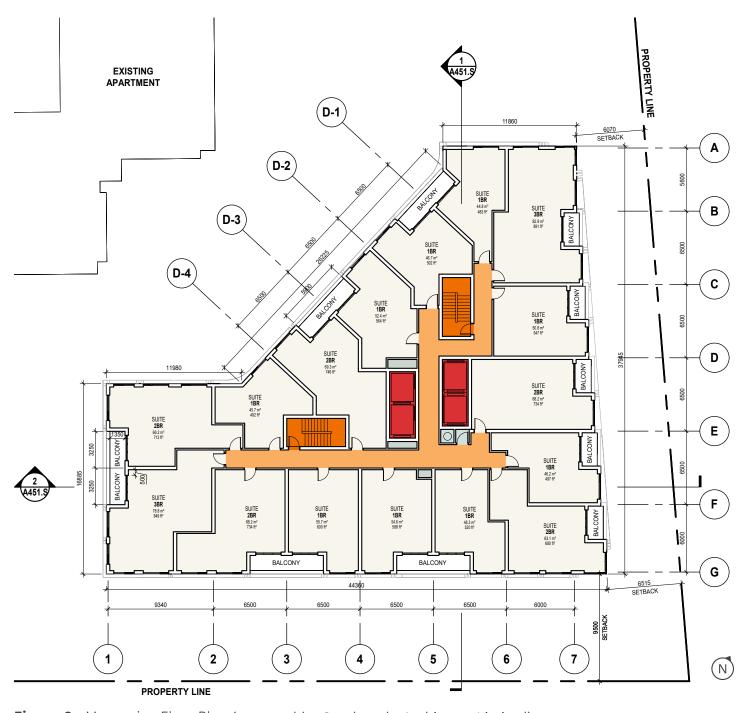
Mezzanine Floor Plan (prepared by Quadrangle Architects Limited)
